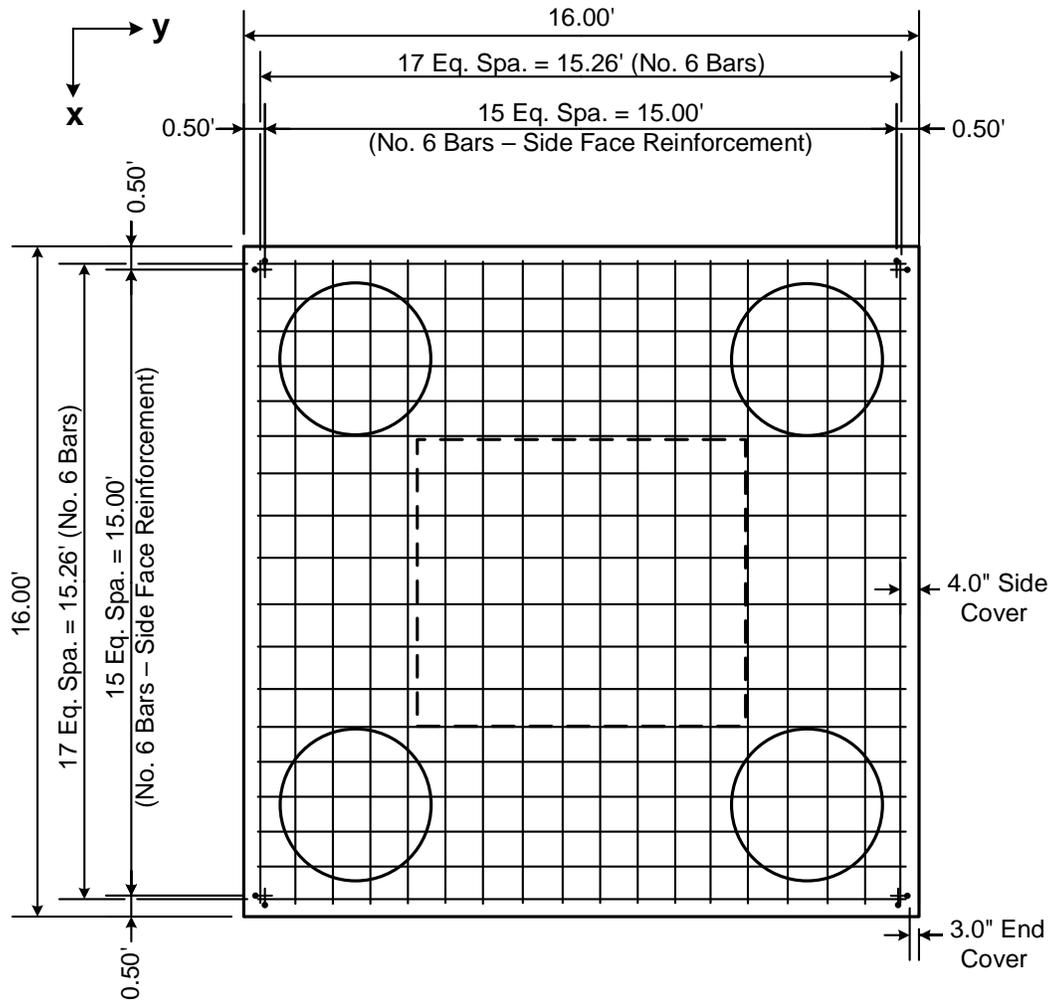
Reinforcement Details 7 - Top Mat Reinforcement
